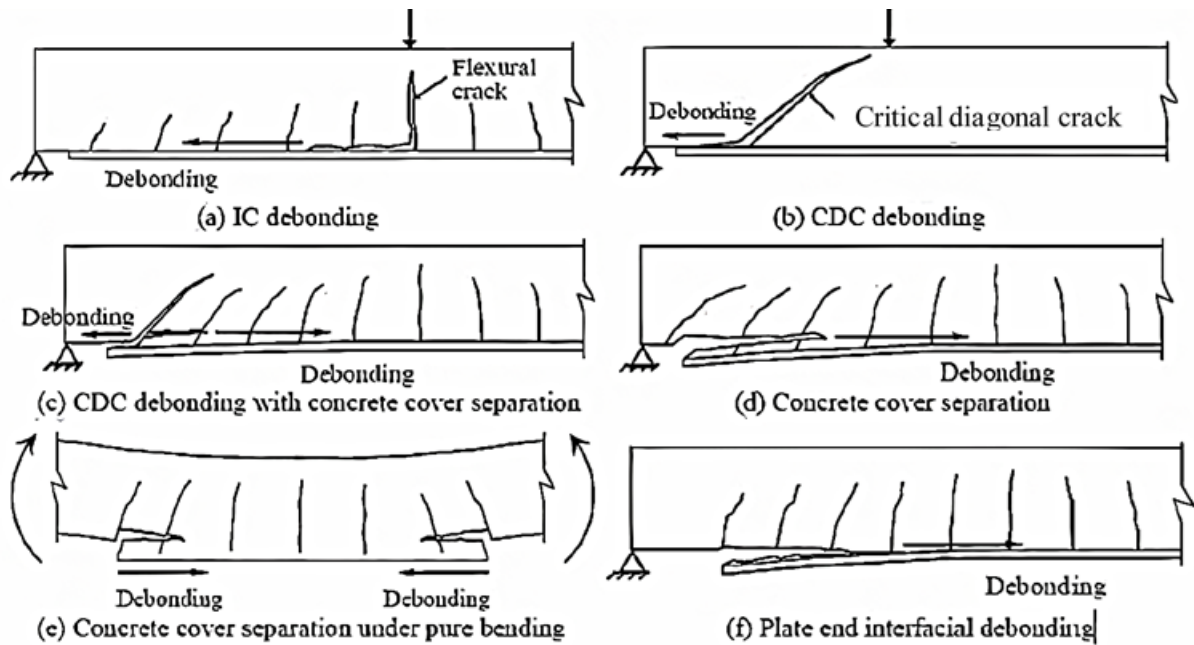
Typical modes of Failure of RC beams bonded externally with FRP plate [32, 33]
